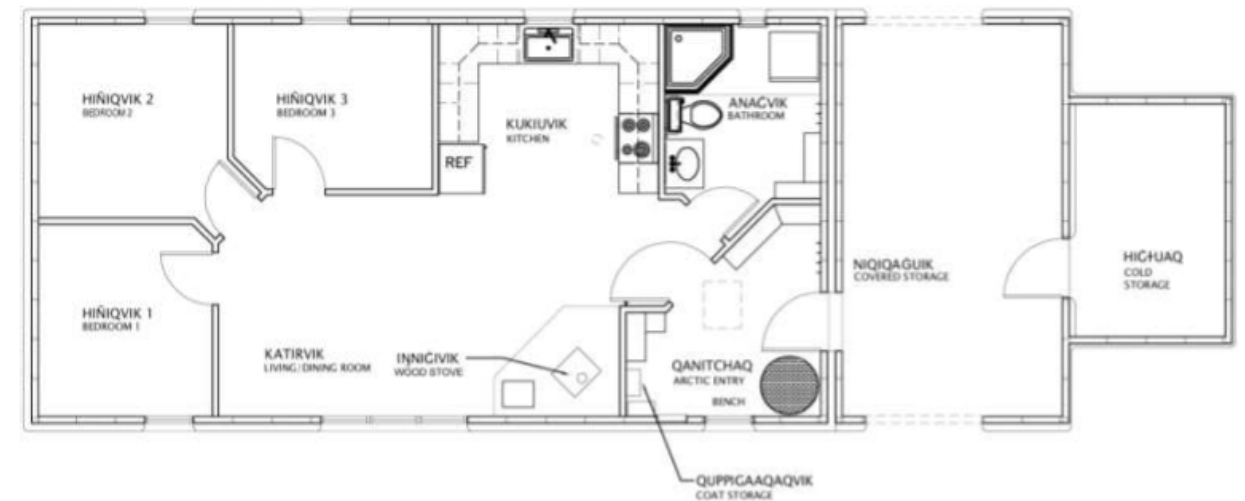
Floor Plan of the Anaktuvuk Pass Sustainable Northern Shelter Project (Hebert, 2010)
